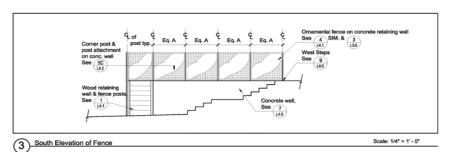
Proposed Nursery: Center for Sustainable Gardening Elevations with Perimeter Fence
